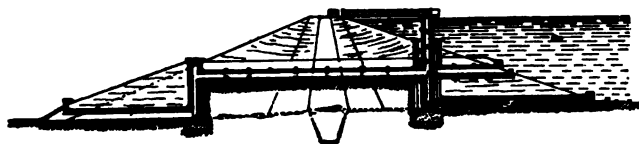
Outlet Pipes and Siphon in Earth Dam.
